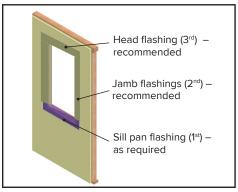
Install rough opening flashing, lapping shingle-fashion (bottom to top of opening).
